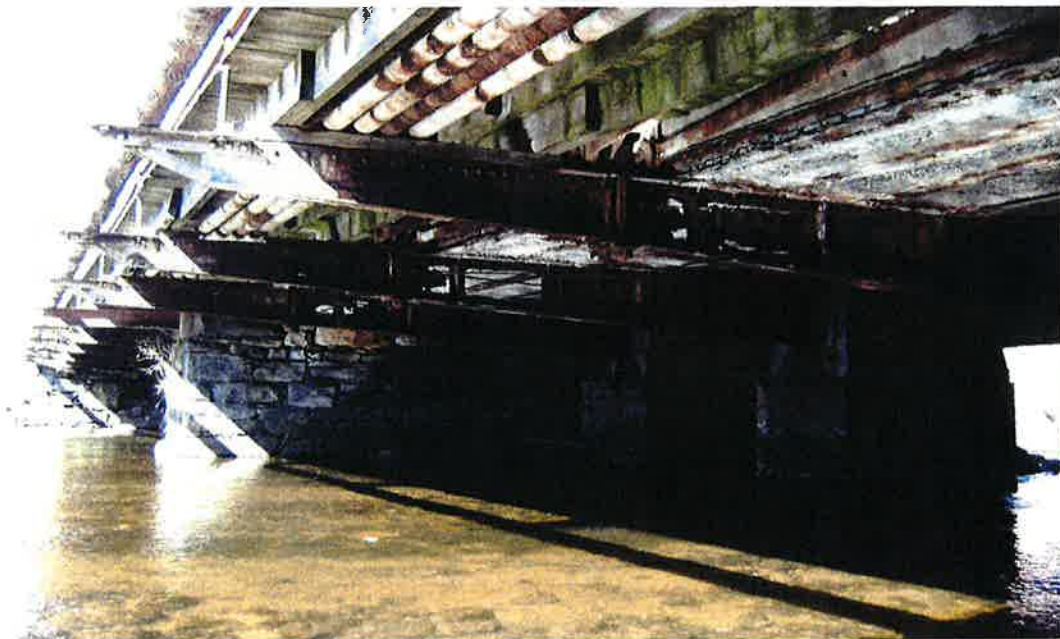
Downstream East Span Floor Beams. Note Intact East Side of Main Pier.
